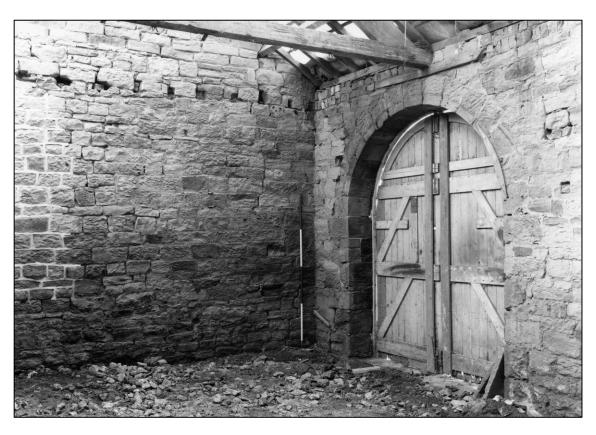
South-east corner of south room, looking SW (photo 1/1).
